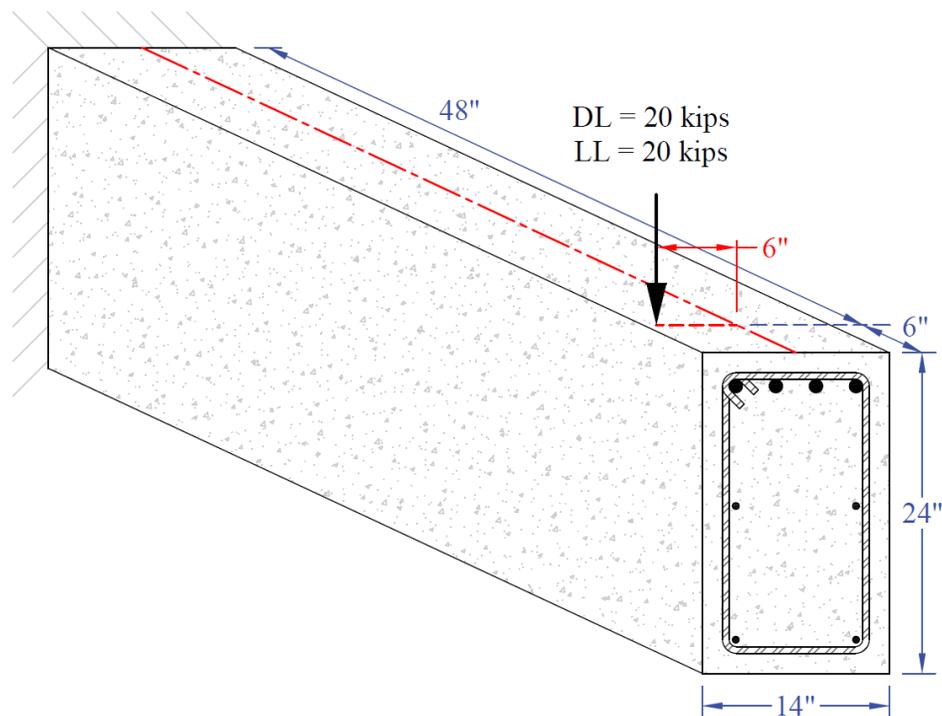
Rectangular Reinforced Concrete Cantilever Beam
